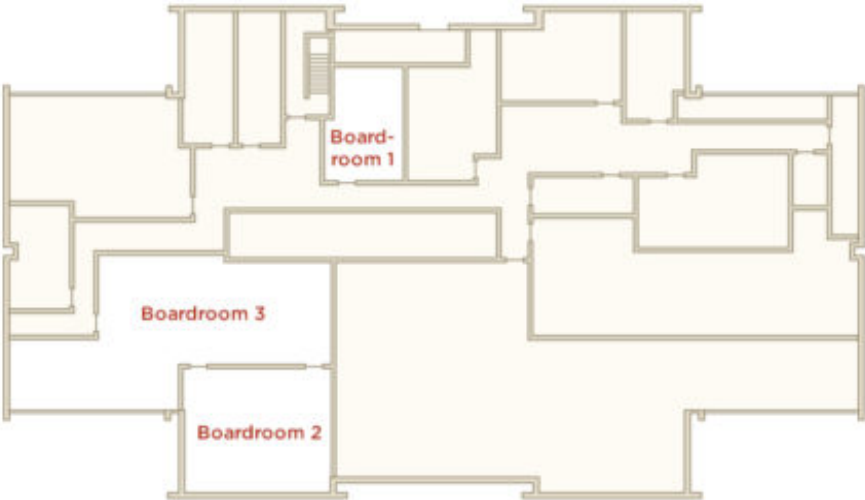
Floor plan. source: <https://swvaculturalcenter.com>
